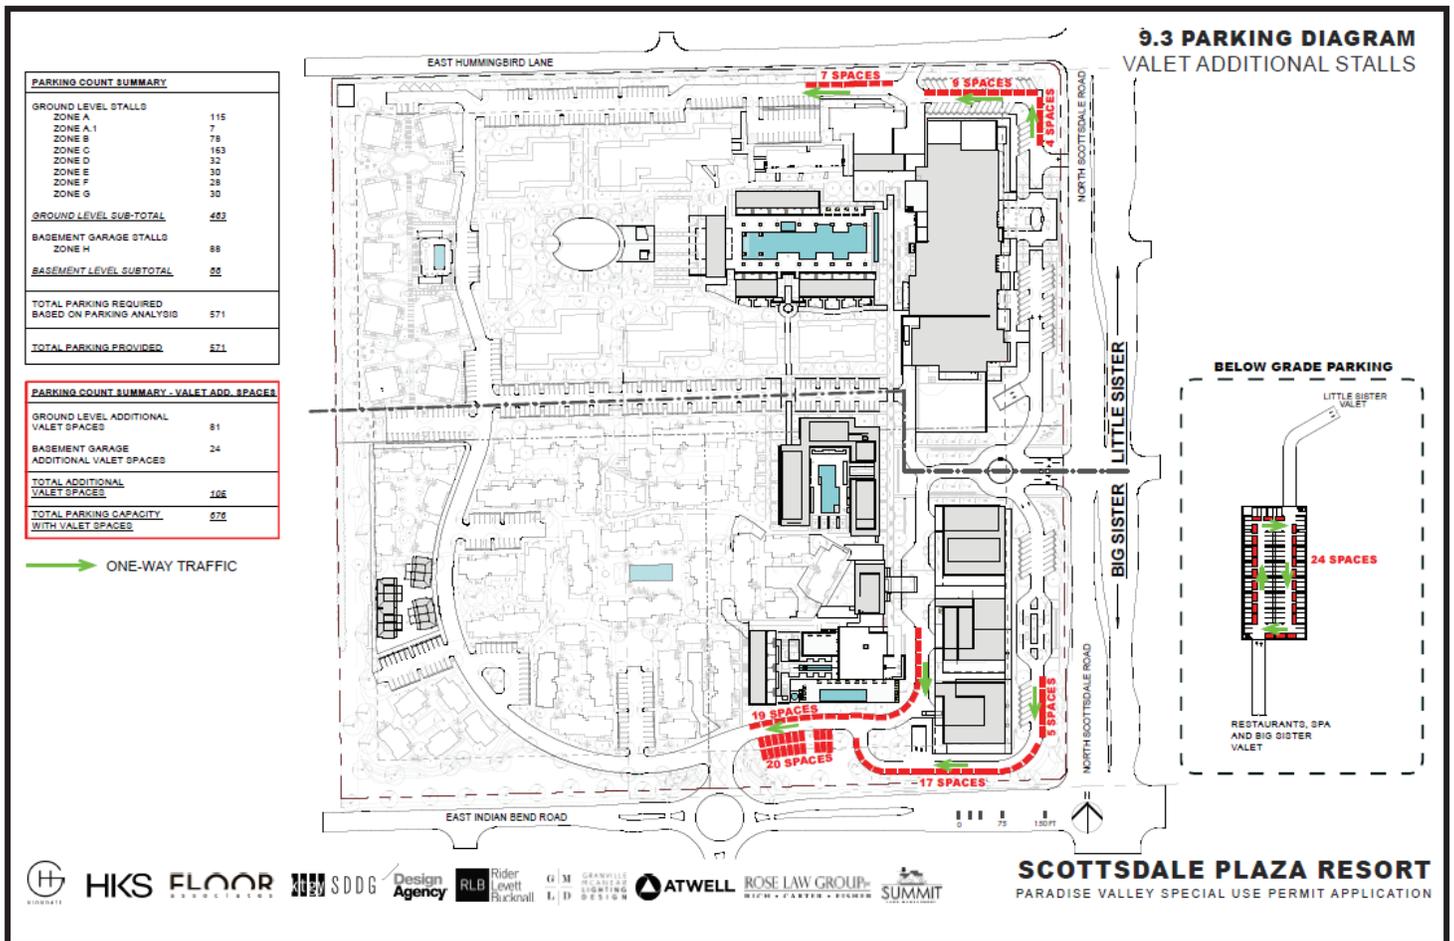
Scottsdale Plaza Resort Valet Parking Plan – Prepared by HKS Architects
